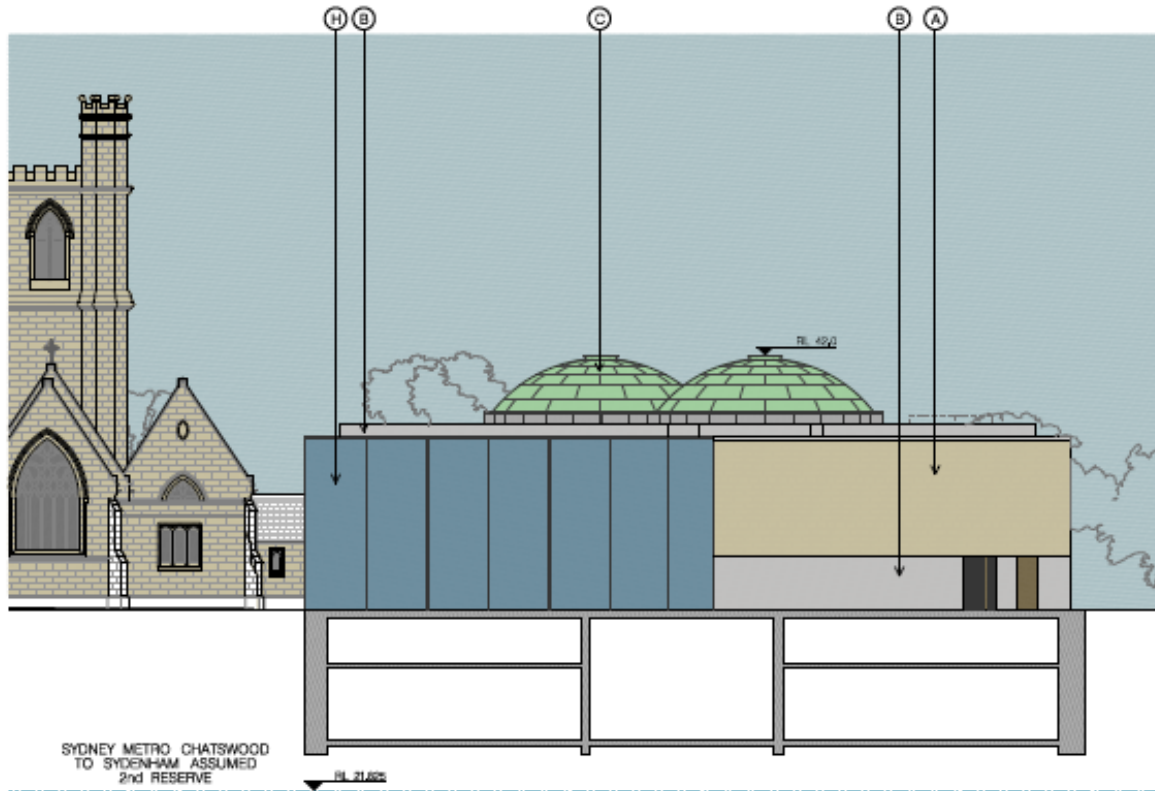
East Elevation - Proposed Museum and Great Hall from within the Site
